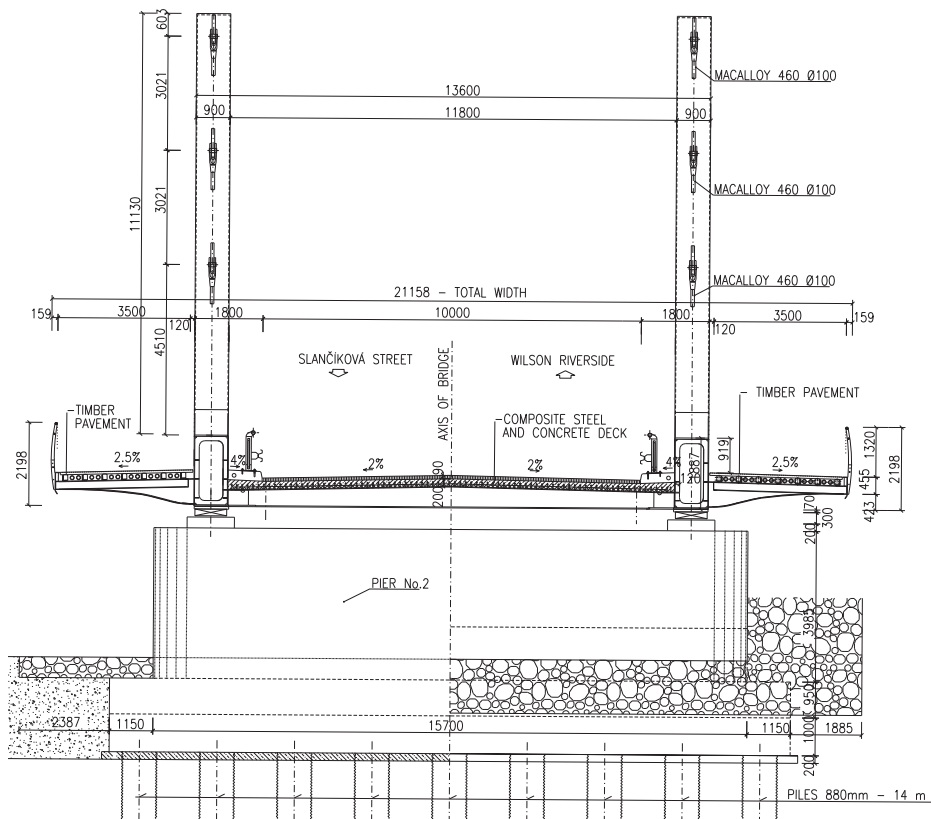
Cross-section above the support No.2 (i.e. above the pier)
